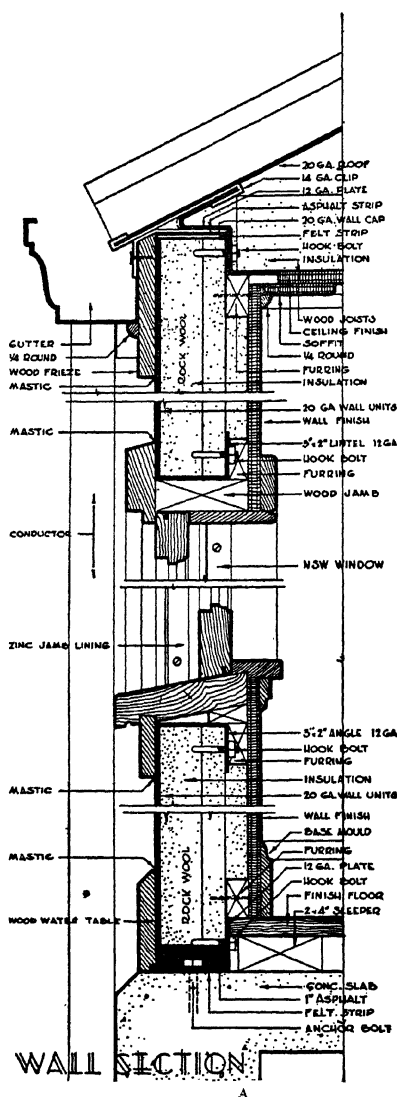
Sections Showing Steel House Details and Typical Methods of Insulation
